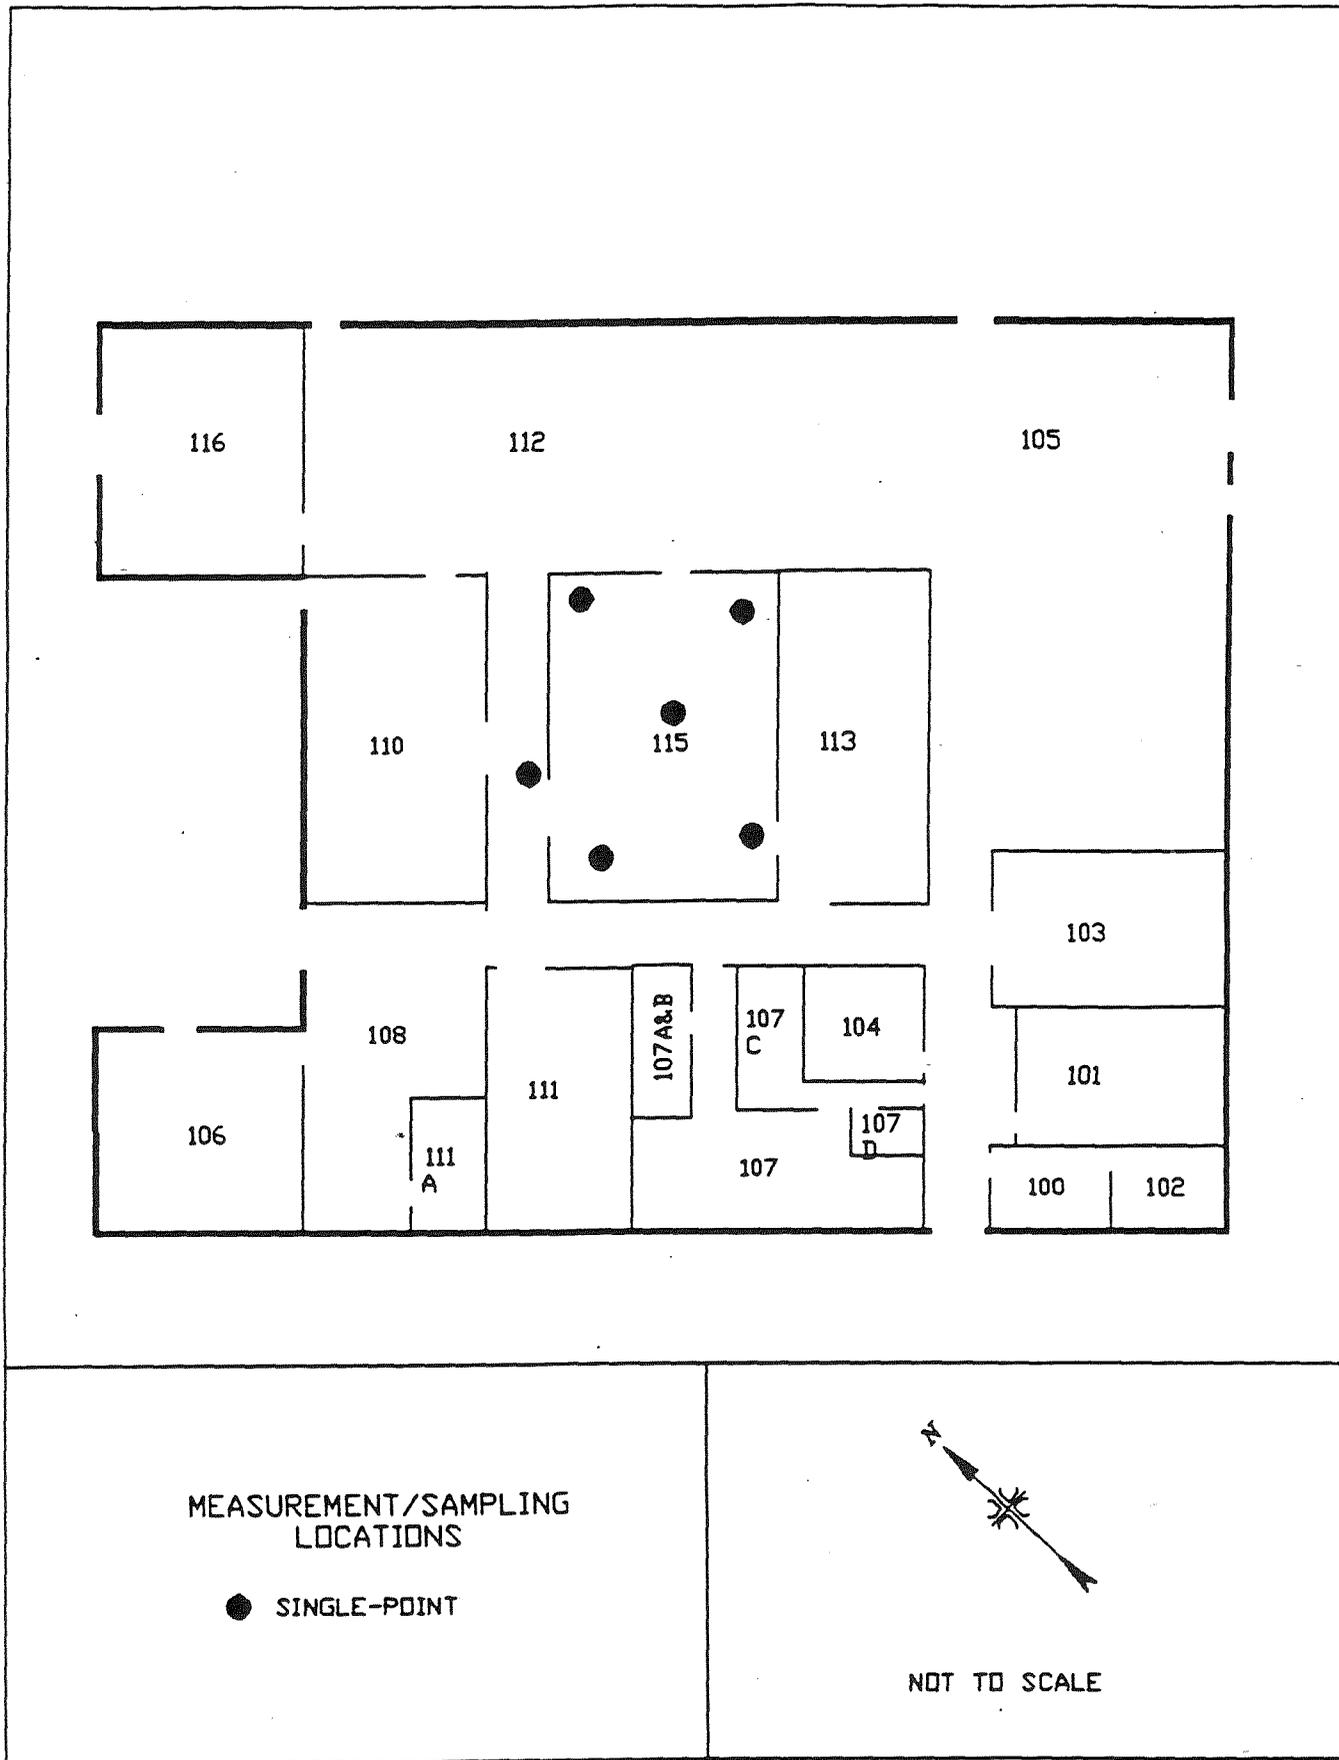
Building 005, Attic - Measurement and Sampling Locations
